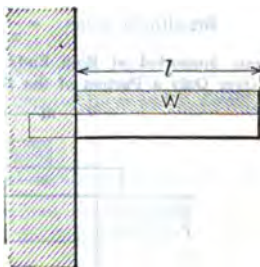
Cantilever Beam. Distributed Load over Entire Span
